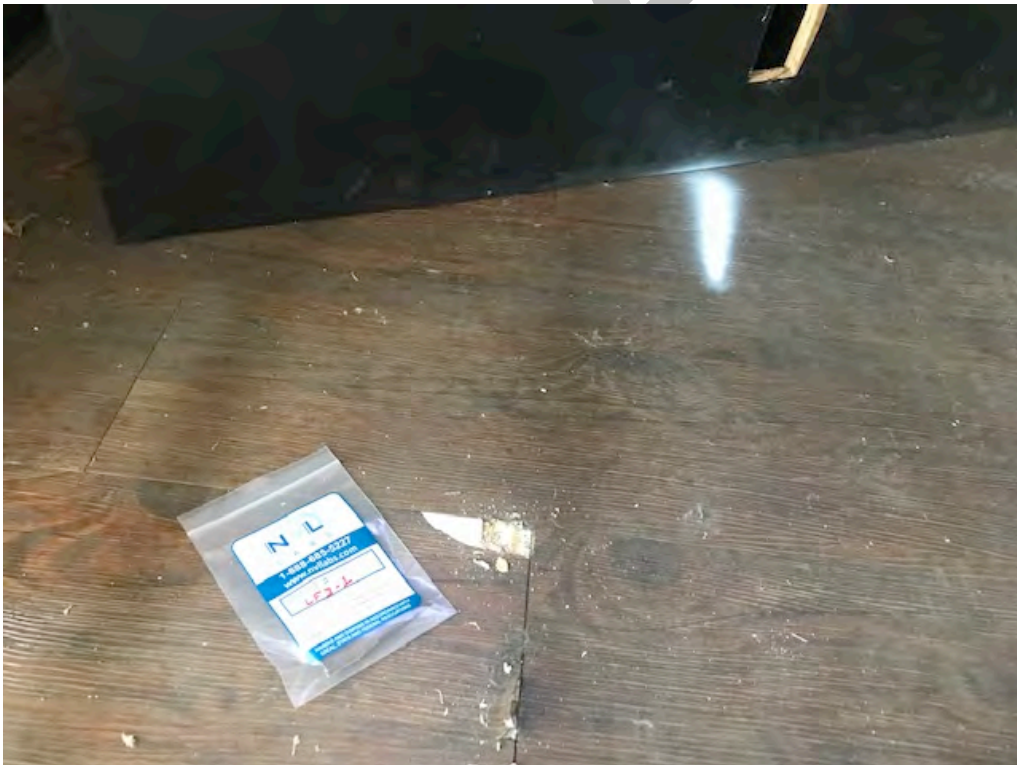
Vinyl Floor Tile/Mastic (VFT1-1), Production Building
